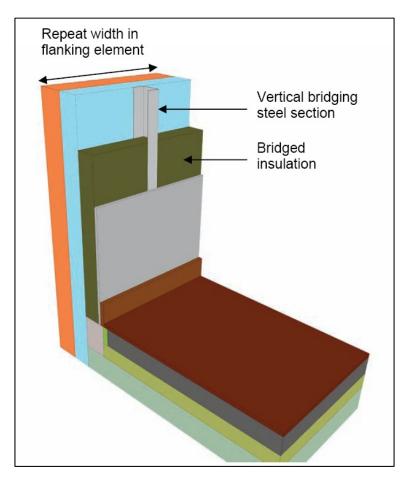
Building detail with repeating thermal bridge. The image also shows a potential linear thermal bridge at the wall/floor junction (Ward & Sanders, 2007)
